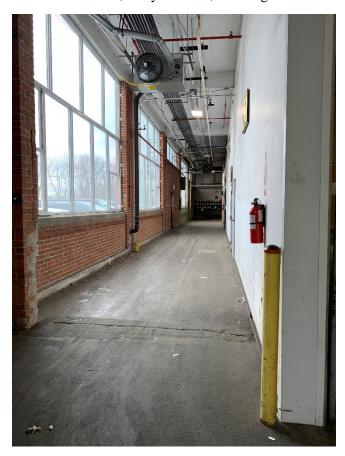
Landers, Frary & Clark, Building No. 823–824 interior, looking south.
